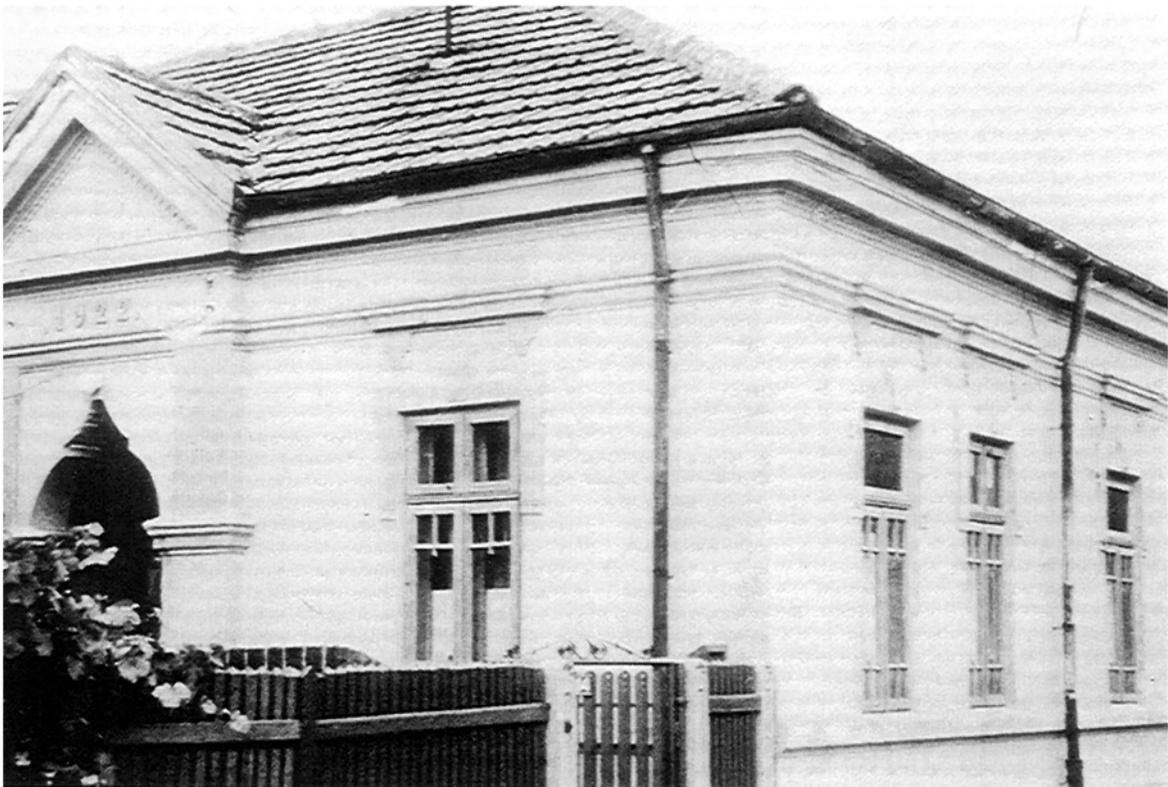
Typical single storey brick masonry building in the Buzau survey.
